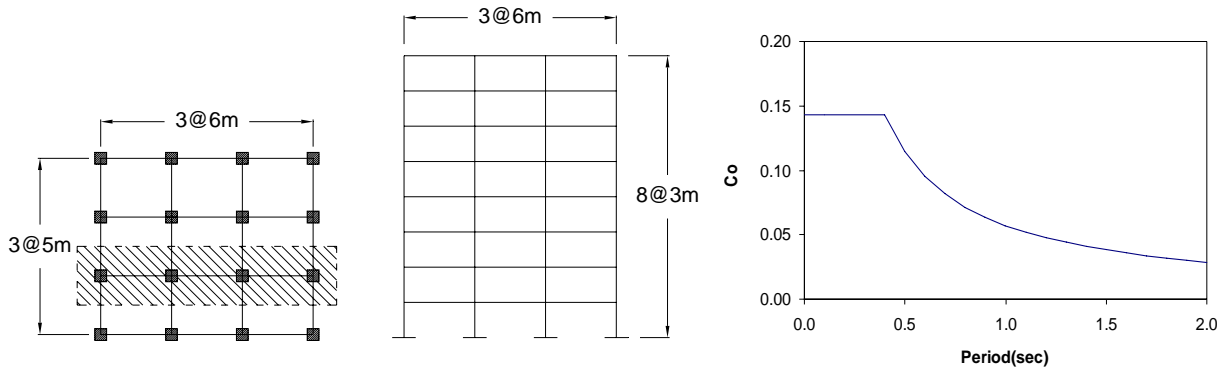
Frame Plan and Elevation and Design Spectrum according to Peruvian Design Code
